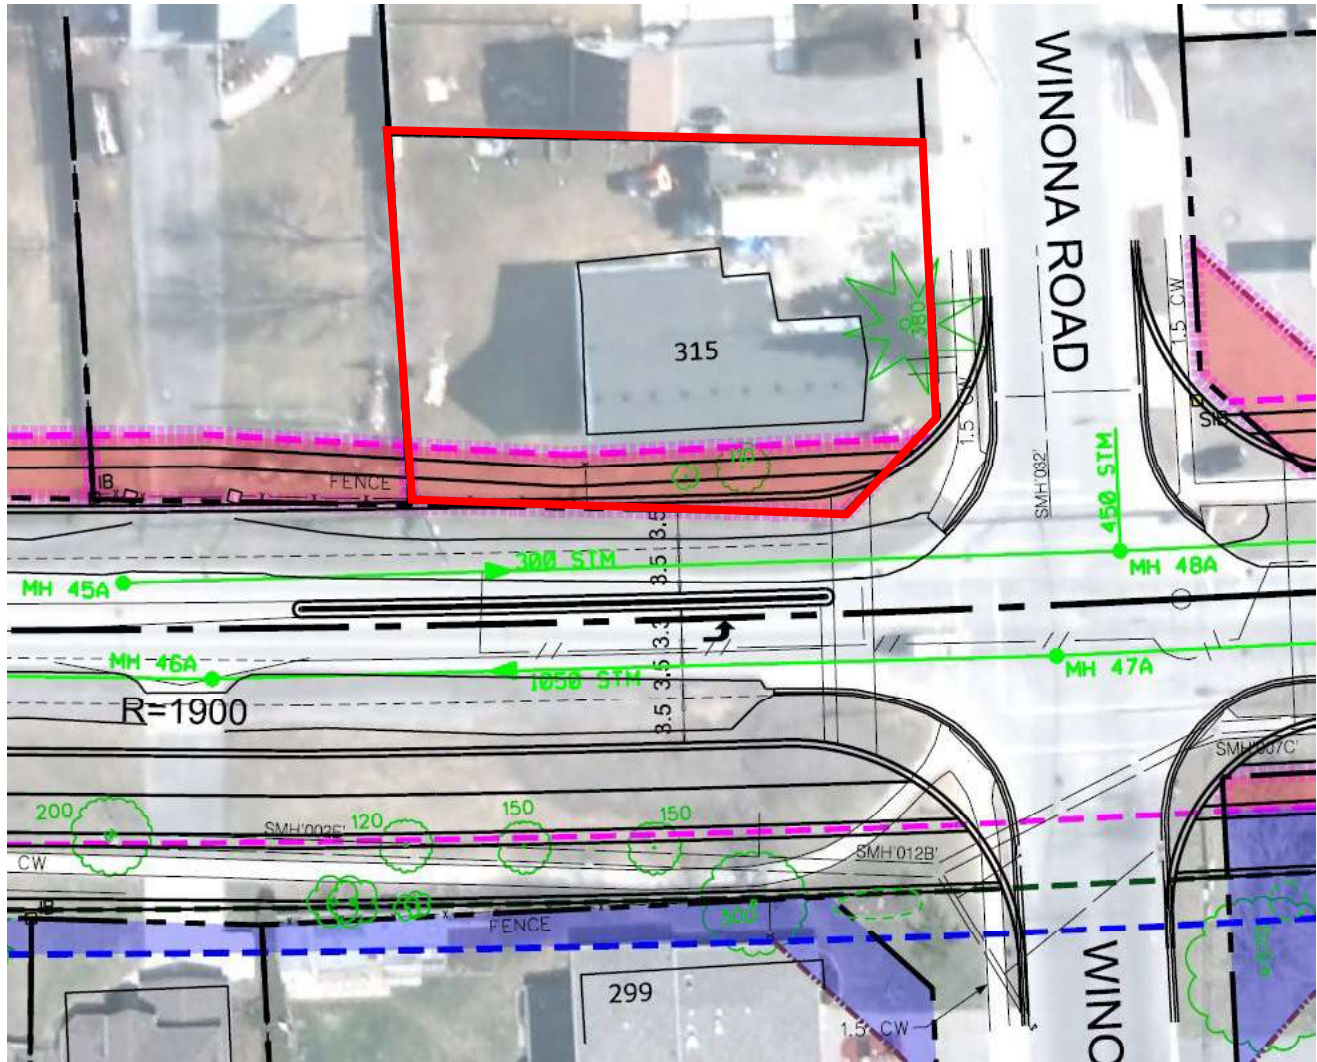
Proposed work in the vicinity of 315 Winona Road (outlined in red)
